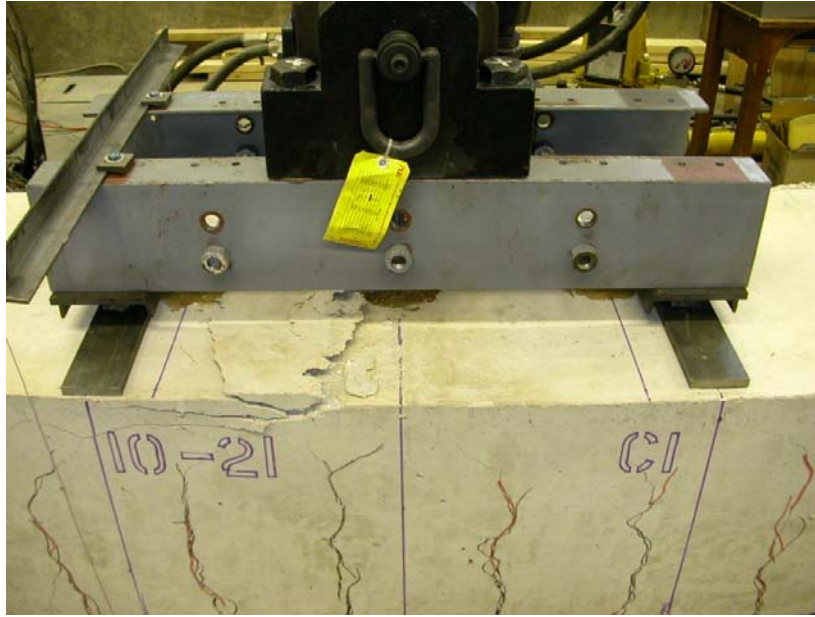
Concrete compression failure in the moment span in beam C-1
